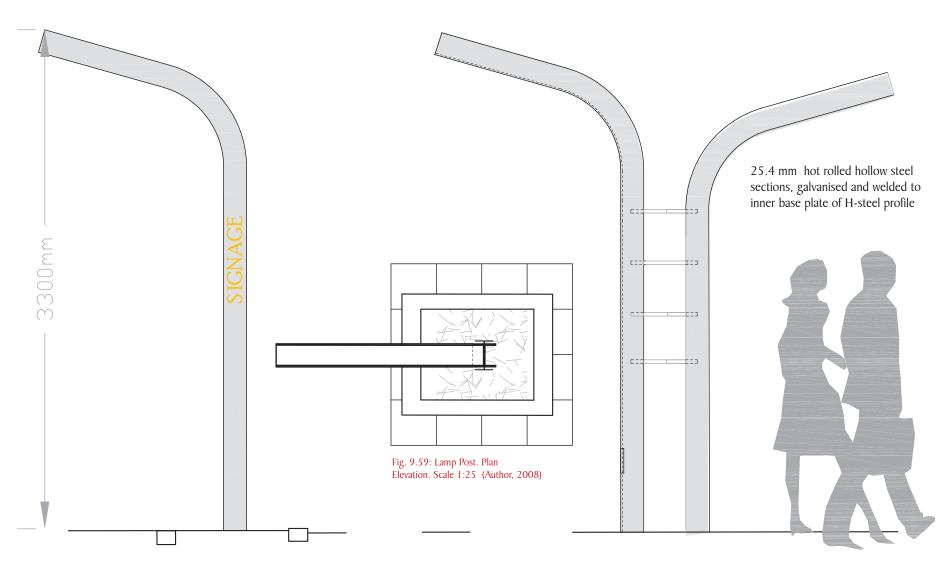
Lamp Post. Elevation. Scale 1:25 (Author, 2008)
